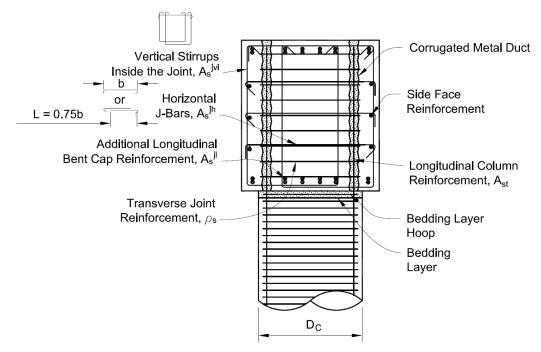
Grouted Duct Full Ductility Joint Shear Reinforcement Details (Section)—SDCs C and D
